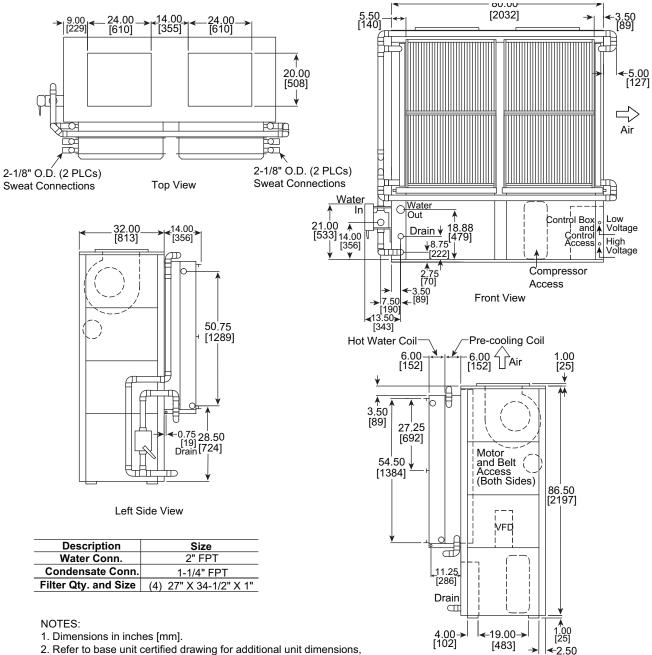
50BVJ 020-028 Dimensions Front Return, Top Supply with Waterside Economizer and Hot Water Coil
